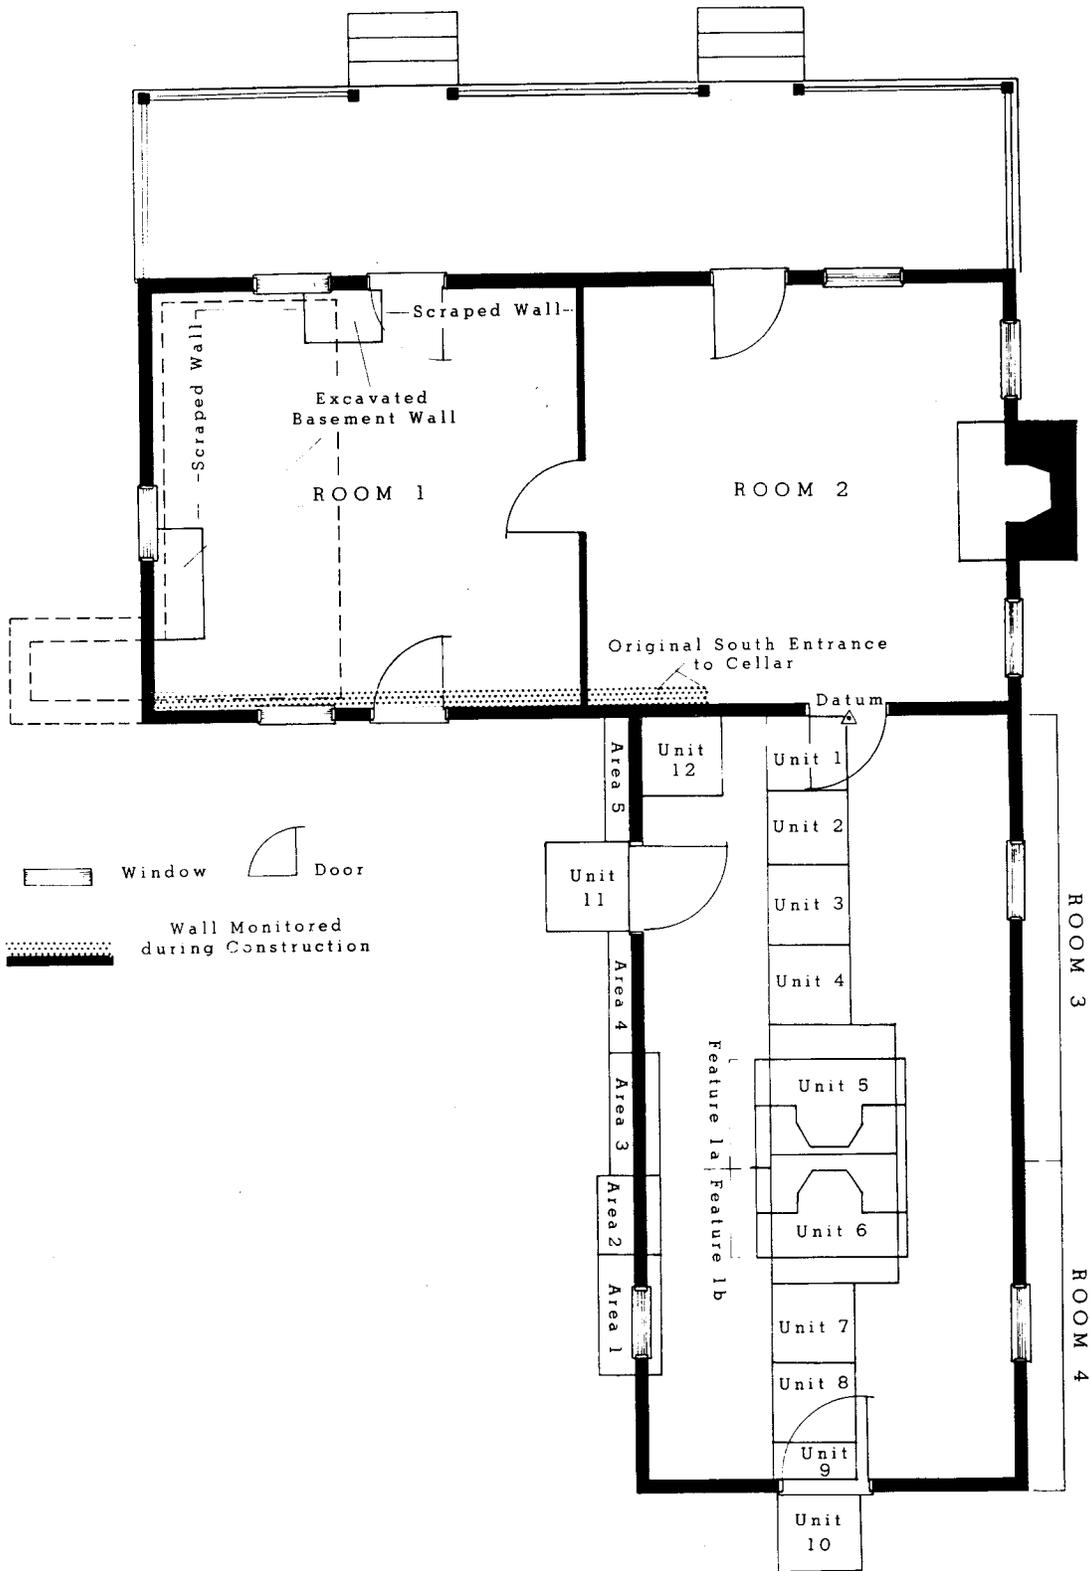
Base map and floor plan of the Ray House showing datum, numbered Areas and numbered excavation Units.
